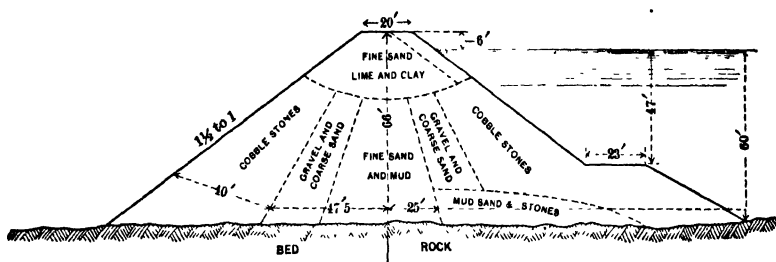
La Mesa Dam; Hydraulic Construction.
